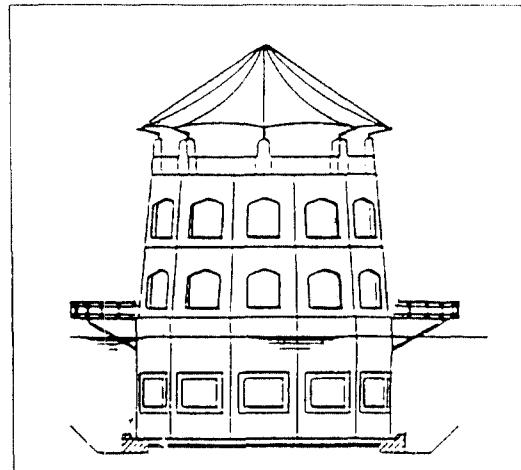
Palace elevation. The building consists of precast reinforced concrete panels.
